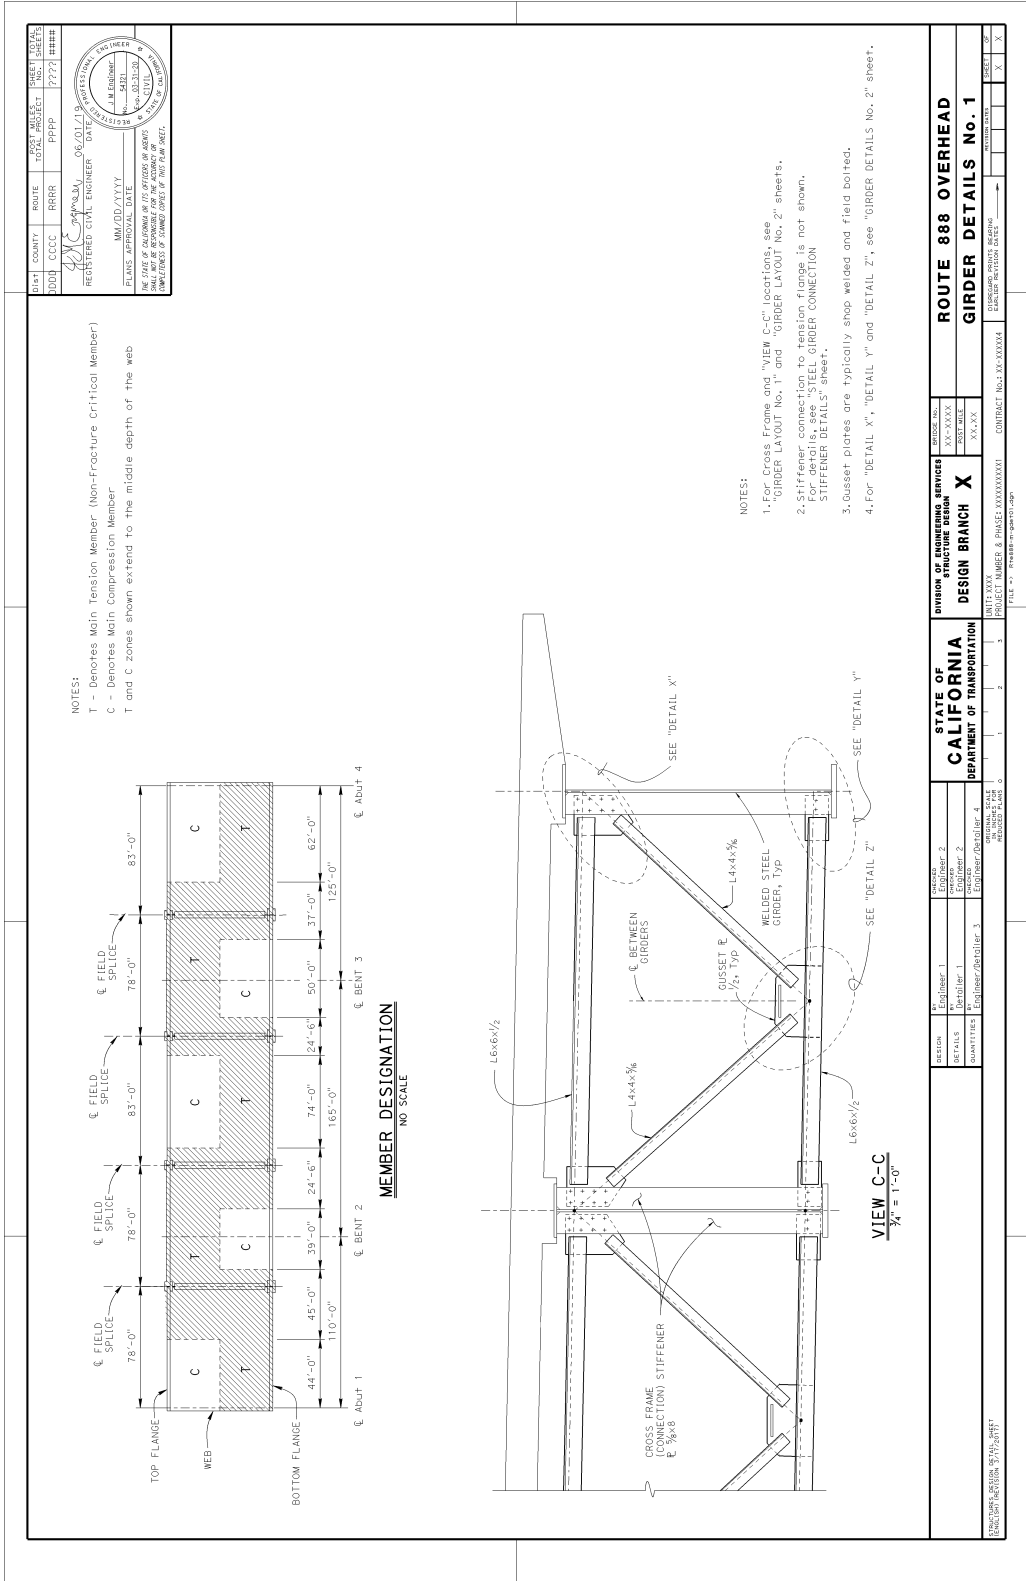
A.A.11 Steel Girder Bridge Detailing Example 11
